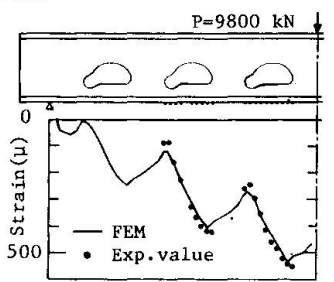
Distribution of strain on the bottom surface of a tensile flange of S-type beam.
